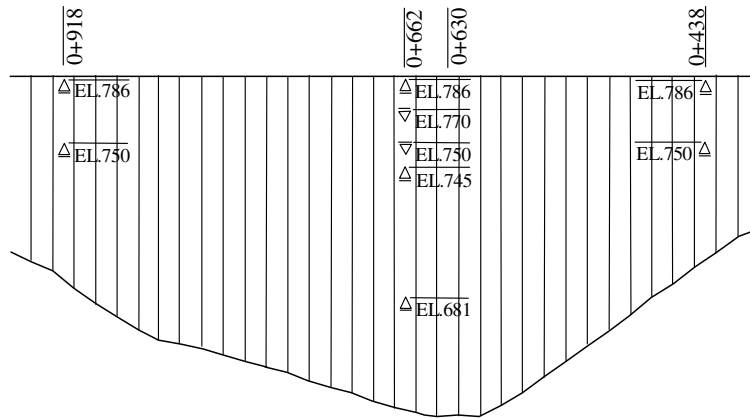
Instrument layout for monitoring the openings between slabs and cushion layer.
